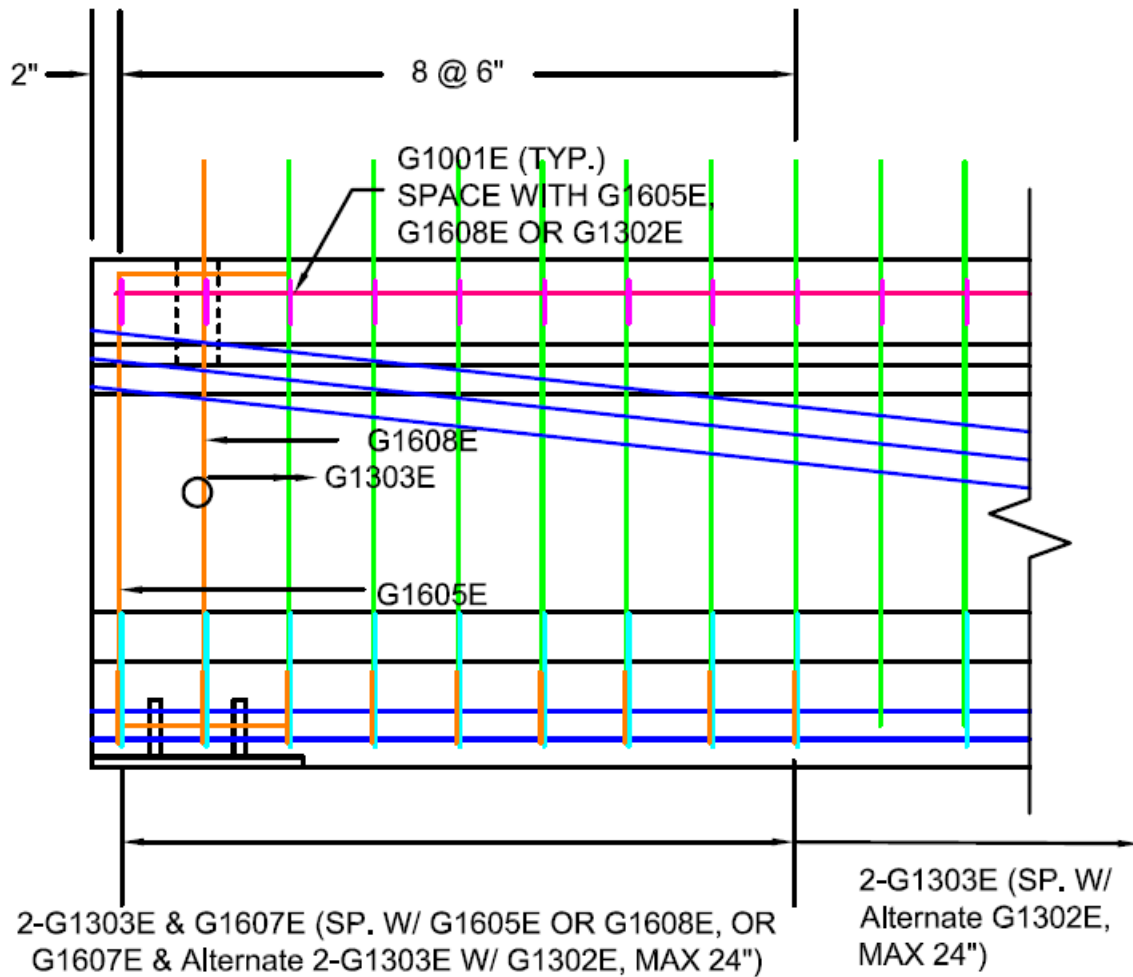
Transverse reinforcement layout for 36M_18F end.
